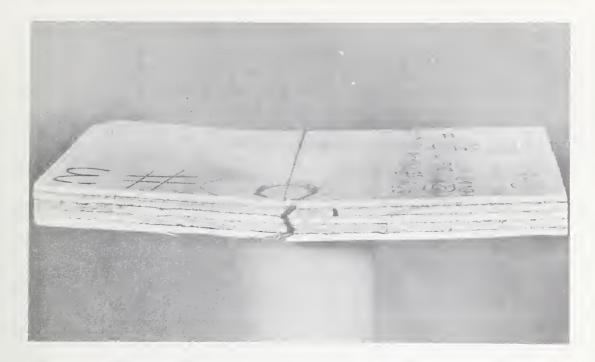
TYPICAL FAILURE OF FLOOR SYSTEM A LOADED OVER A 1-in DIAMETER AREA
